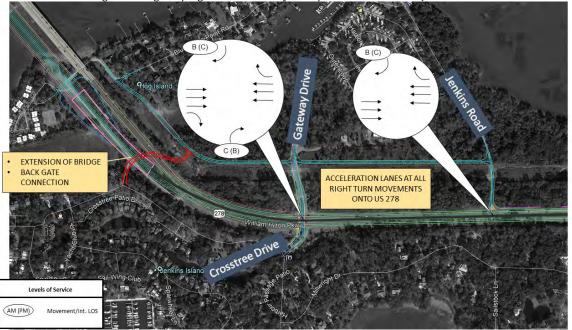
Right In/Right Out at Gateway Drive/Crosstree Drive and Jenkins Road
